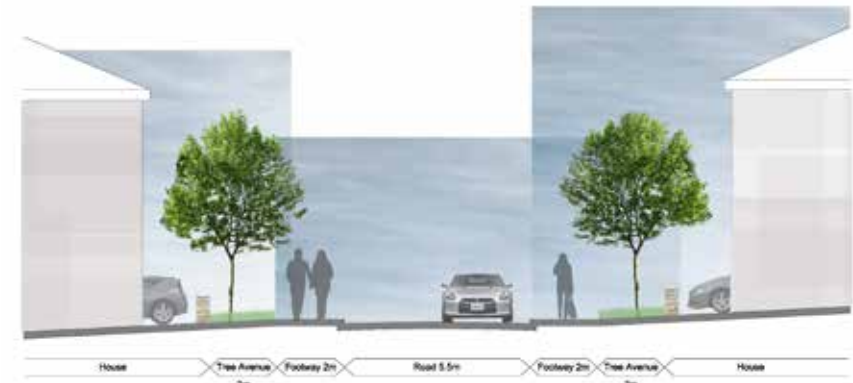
STREET SECTION, MAIN ACCESS ROAD - AVENUE - PHASE 1,2 AND 4
